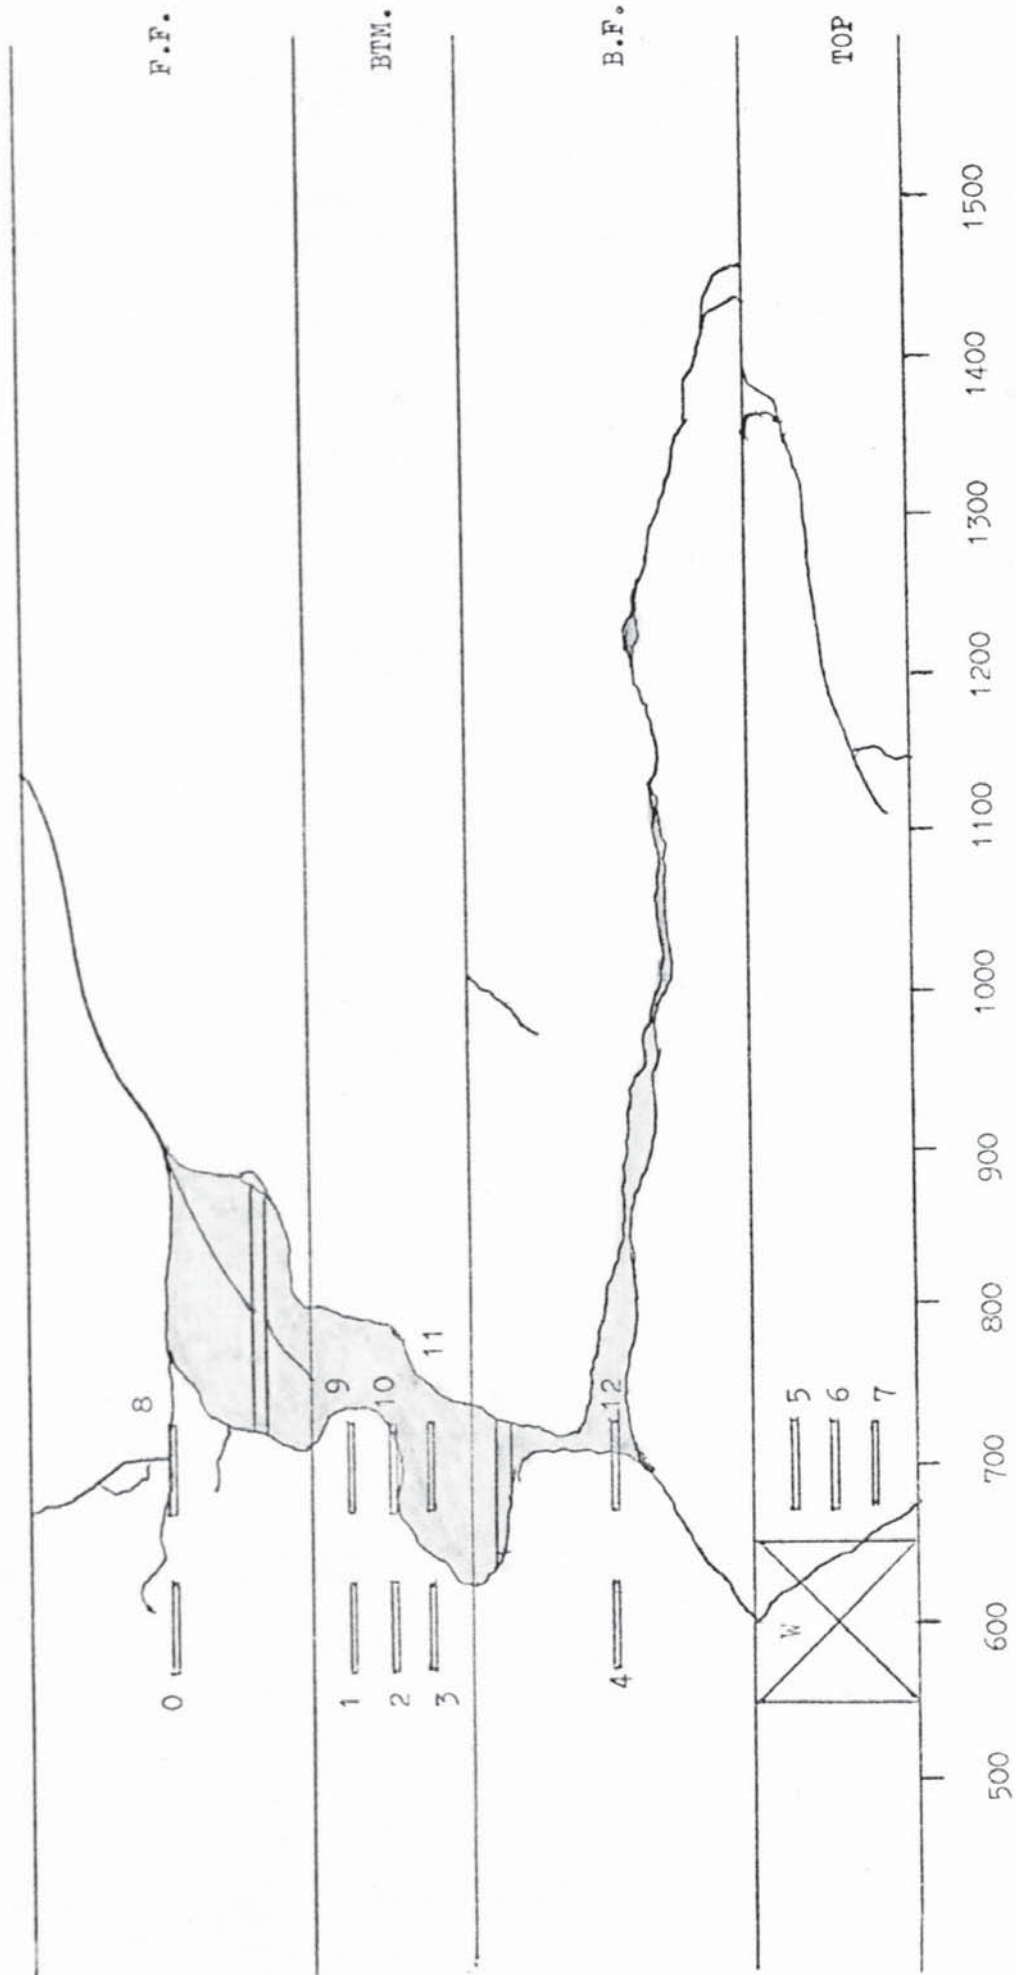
FAILURE CRACK PATTERNS - BEAM 33 ( MODE 2 )
